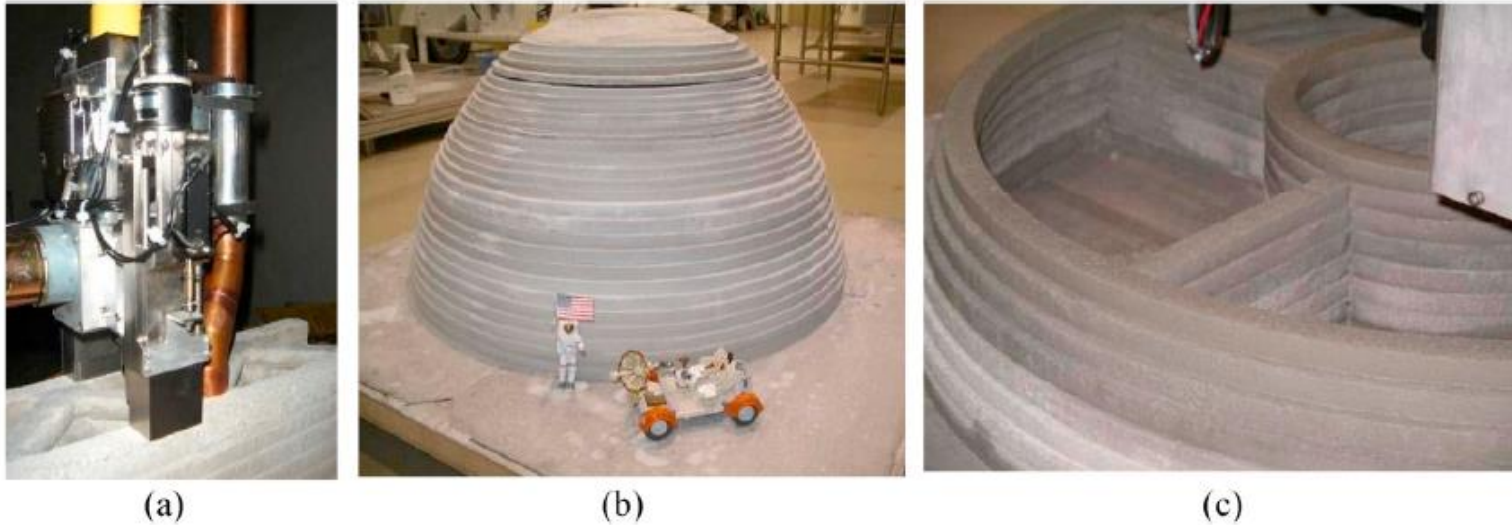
Contour crafting: a) Co-extrusion CC nozzle building walls with corrugated fill; b) & c) Dome structures built by means of contour crafting, [181].
